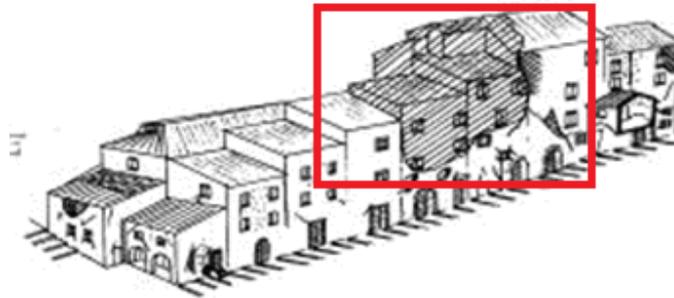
Block effect damage in interior of row; unchanged interior buildings surrounded by repaired structures[2]
